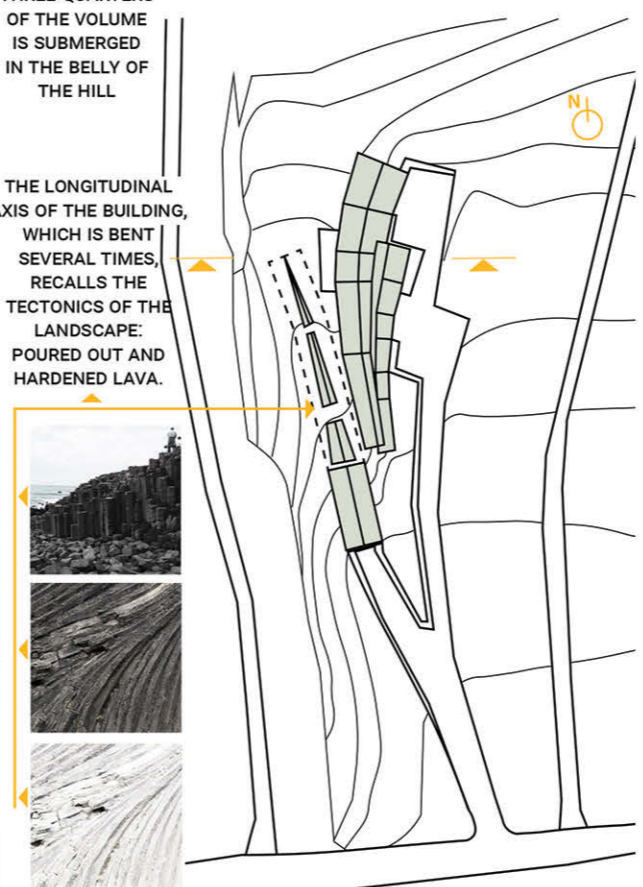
SITE PLAN - COURTYARD SCALE, REFLECTING THE SHAPE OF THE BUILDING FOOTPRINT
